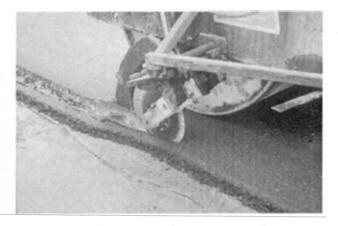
Cutting wheel used to construct longitudinal joint.
